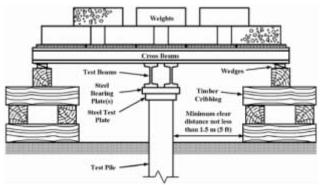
Schematic Hydraulic Jack Acting Against Weighted Box or Platform
